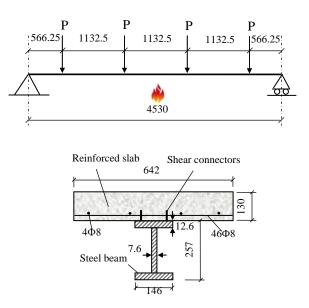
Schematic of tested composite beam (Test 15 and Test 16) (all dimensions in mm)
